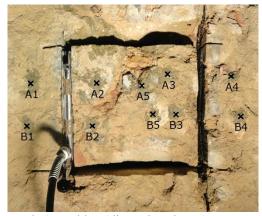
Shear flat-jack test setup and gage point's position (dimensions in cm).
